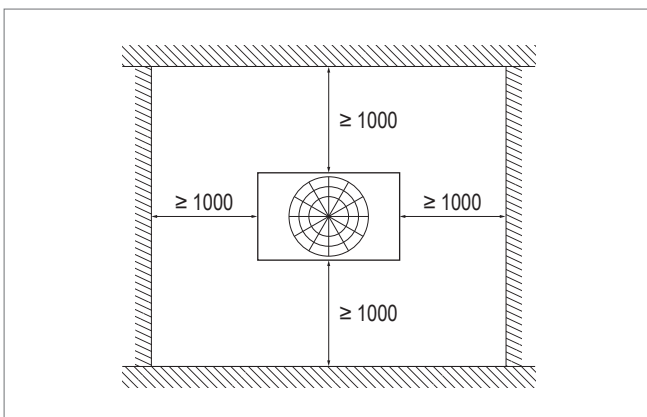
Minimum distances for the heat pump (dimensions in mm)
